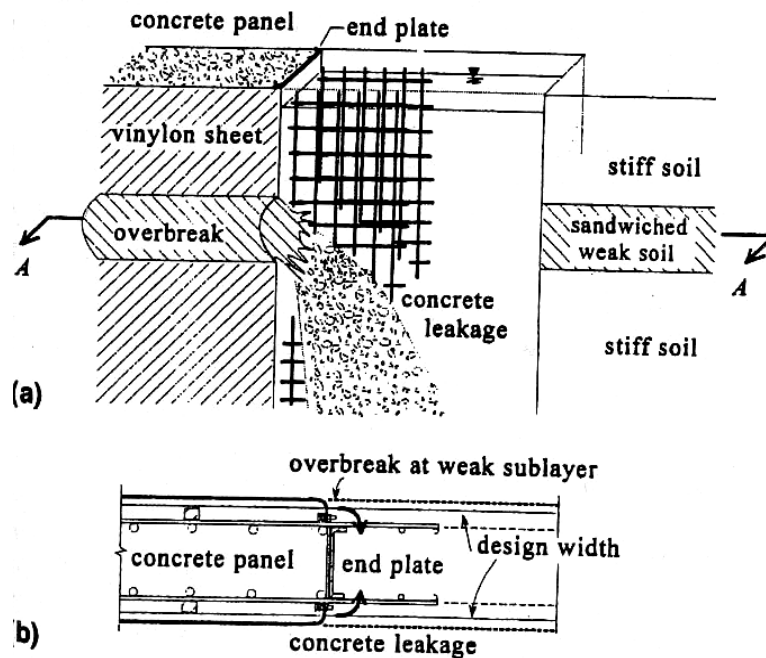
Vinyl Sheet and Steel-Plate Joint: (a) Concrete Leaking into Overlapping Section through Broken Vinyl Sheet, (b) Plan View of Overlapping Joint
